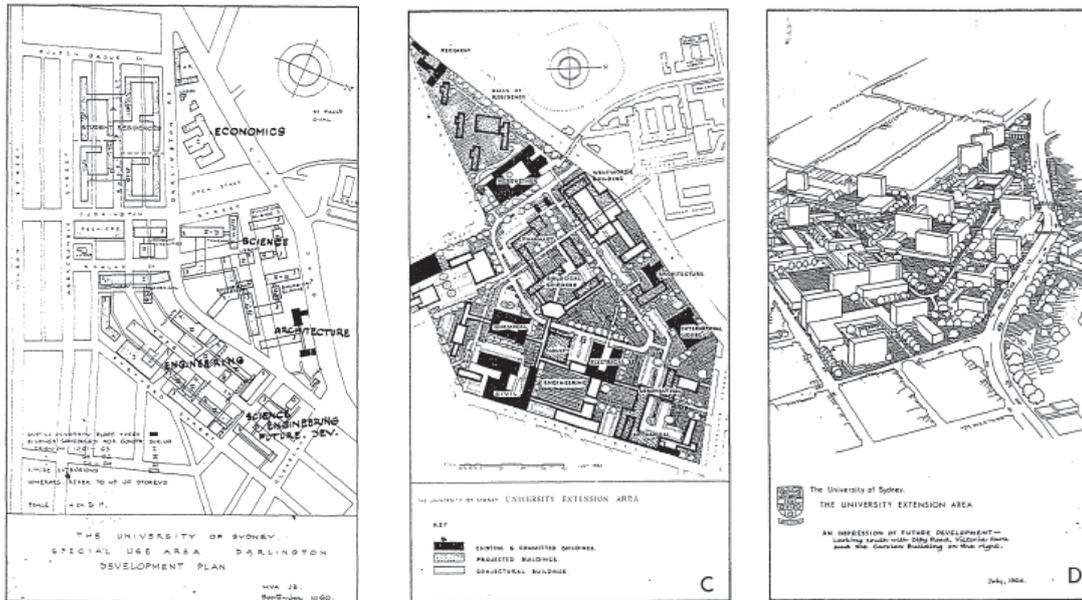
Planning the Darlington Campus: 1960 concept by Walter Abraham imposed over the Darlington street pattern (left), revised plan from 1964 envisaging demolition of the Institute Building and construction halls of residence in its place (middle) and an impression of how the 1964 plan might turn out.
